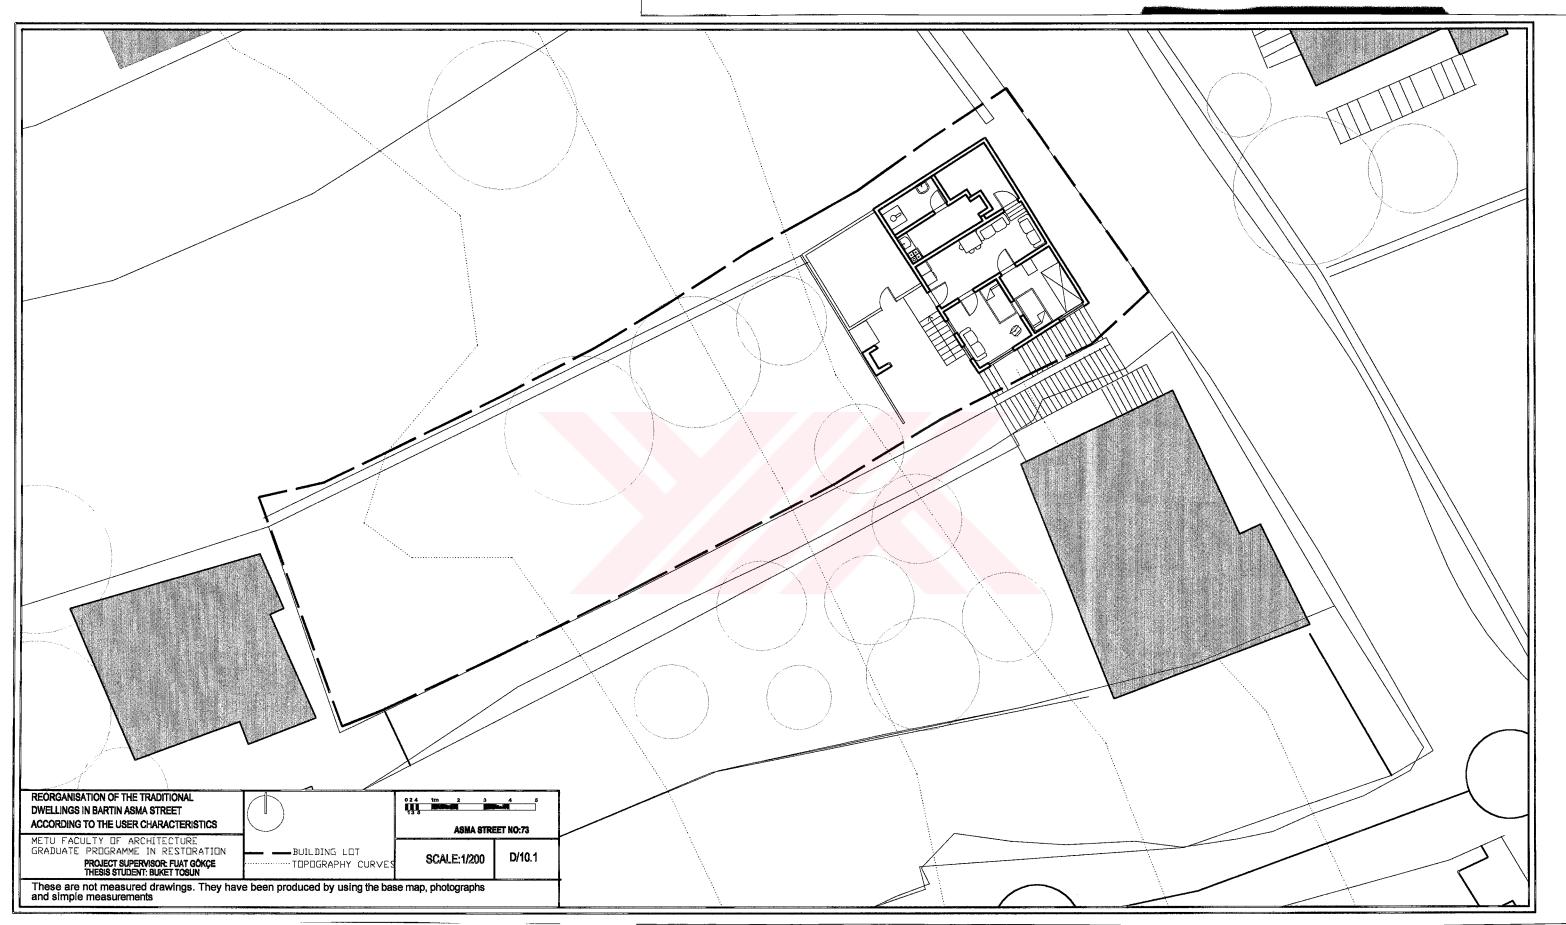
Sketch Drawings of the Building Lot of Building No.73
